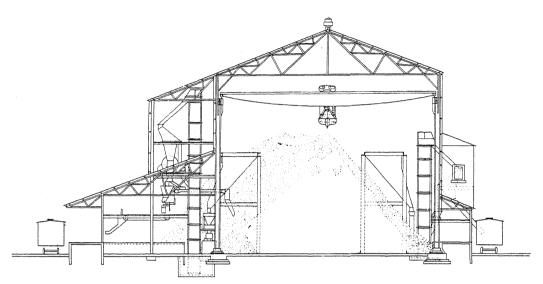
SECTION OF BUILDING SHOWING MIXING AND SHIPPING UNITS
